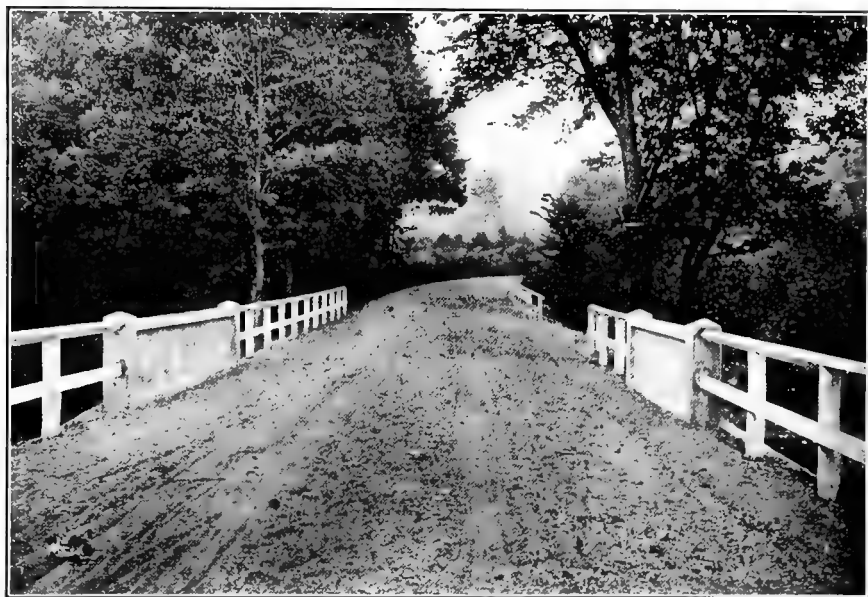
REINFORCED CONCRETE BOX CULVERTS.
